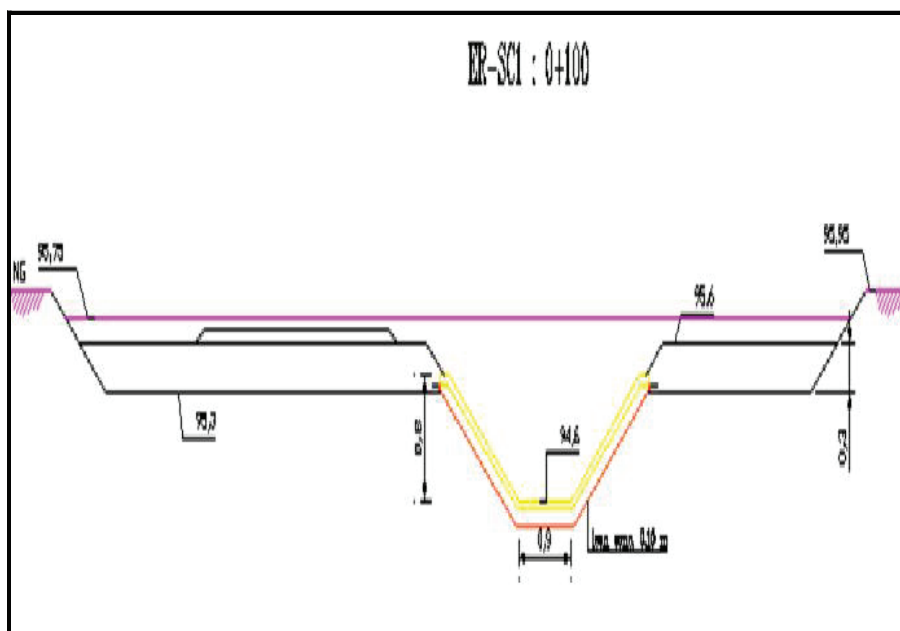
ER-SC1 canal cross section in using prefabricated bituminous Geomembrane “PBGM” when the trapezoidal section is entirely in excavation (Section ER-canal SC1 croix dans l’aide préfabriquées bitumineuses Géomembrane “PBGM” lorsque la section trapézoïdale est tout à fait dans l’excavation)
